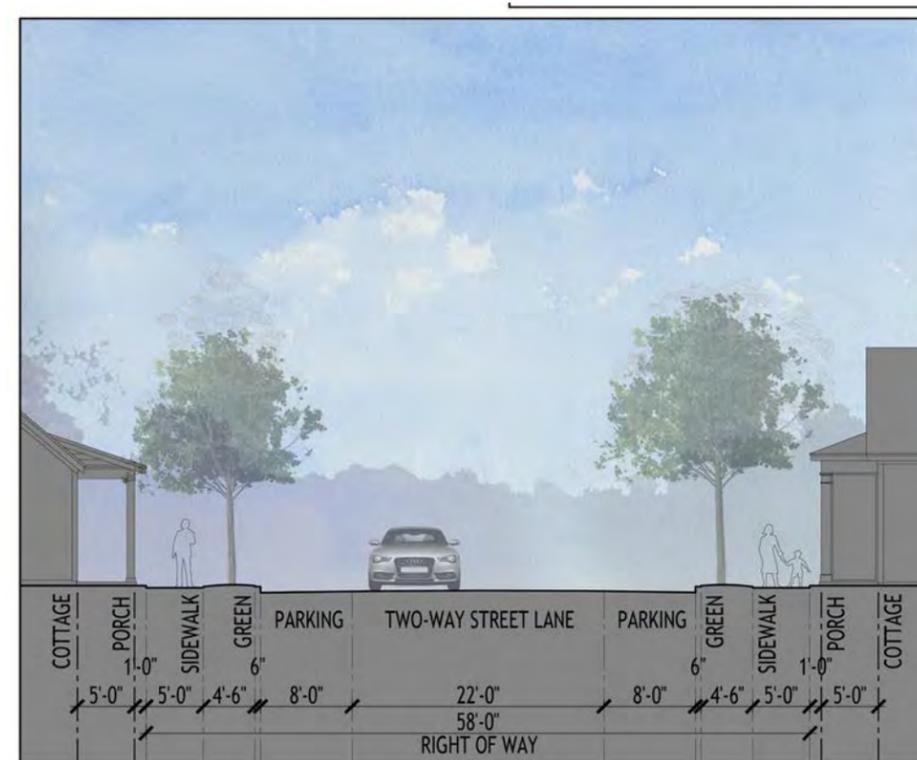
EXHIBIT H: TYPICAL STREET SECTION & PLAN VIEW
